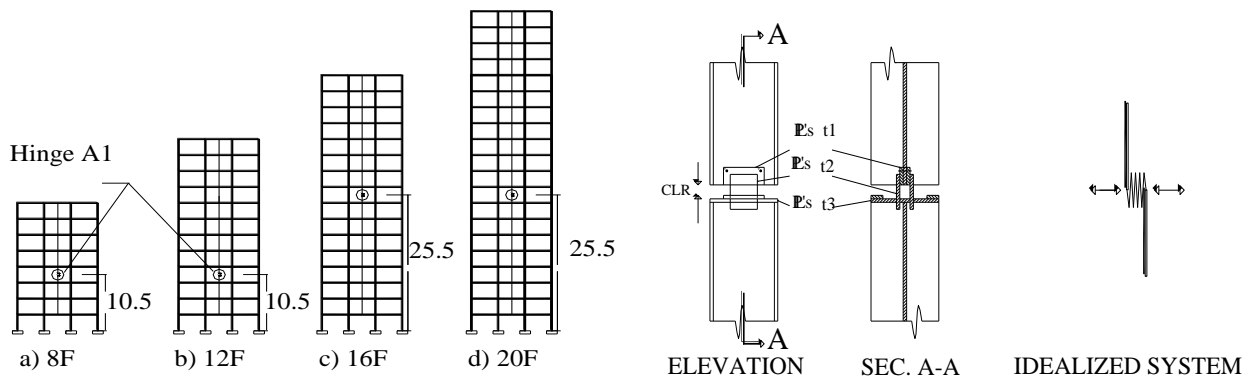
Elevation of FST and details of hinge A1 of FST (Elkordi et al.-1998).
